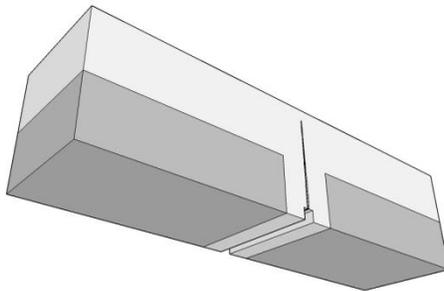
a waterproofing coating of aluminium foil covers the side and bottom faces of the mortar specimen, except for a section of 10 mm to each side of the crack.
